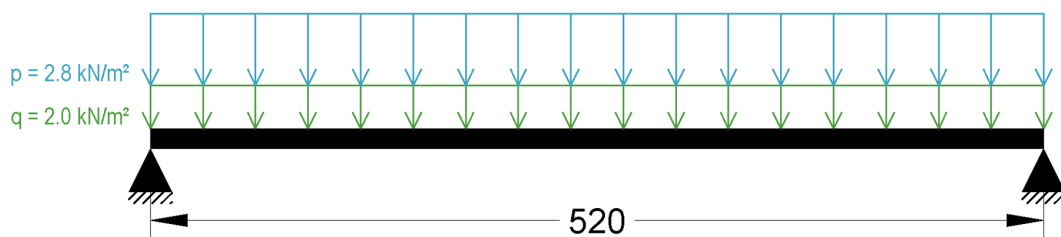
Scheme of loads on one-way slab with 5.20 m span
